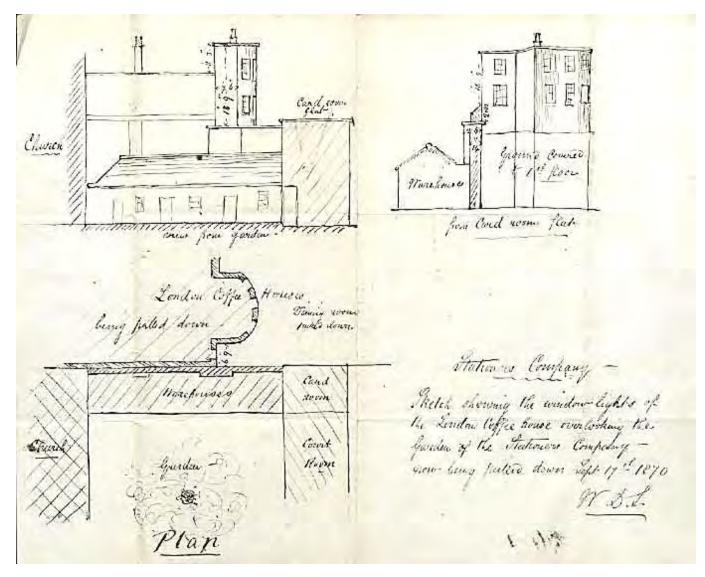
Sketch showing the London Coffee House overlooking the Stationers' Hall Garden, September 1870. Note the characteristic tree within the Garden and the Warehouse building, showing a different door arrangement to that seen today (TSC/1/G/02/05/08/10)
